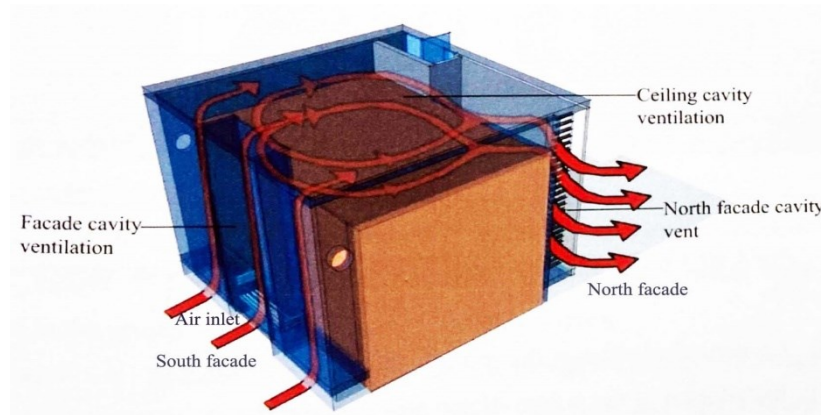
An X-rayed view of the Ventilated Cavity Wall showing the process of ventilation through the inlet and outlet vent points
